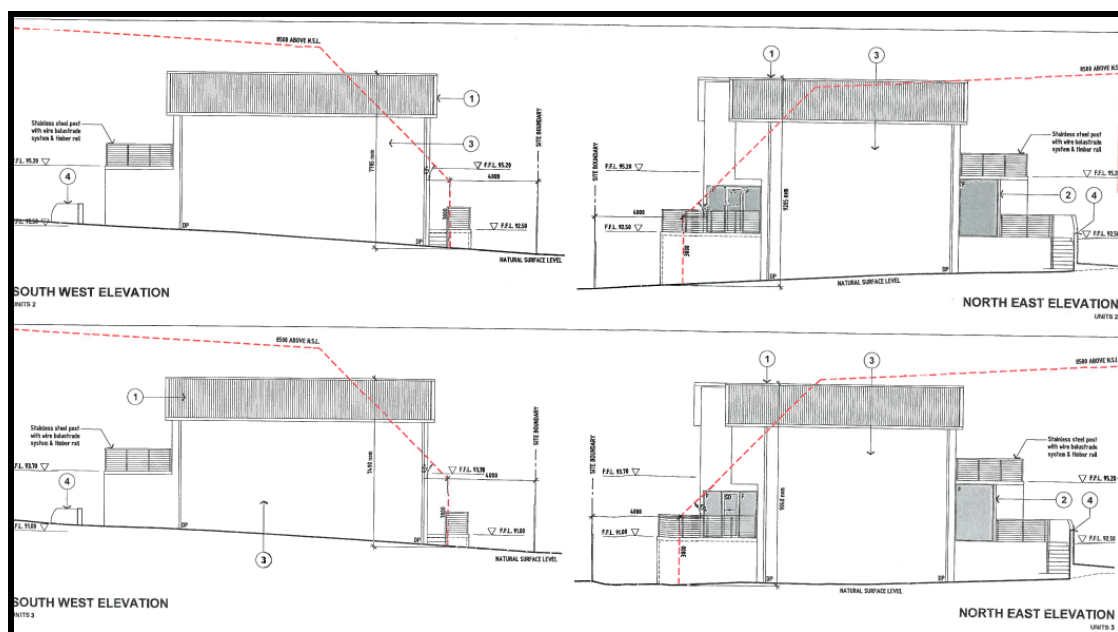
An excerpt from the submitted plans showing the extent of proposed dwelling units 2 and 3 protruding outside the building envelope.
